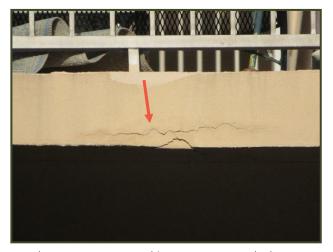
Cracking at concrete balcony slab edge
